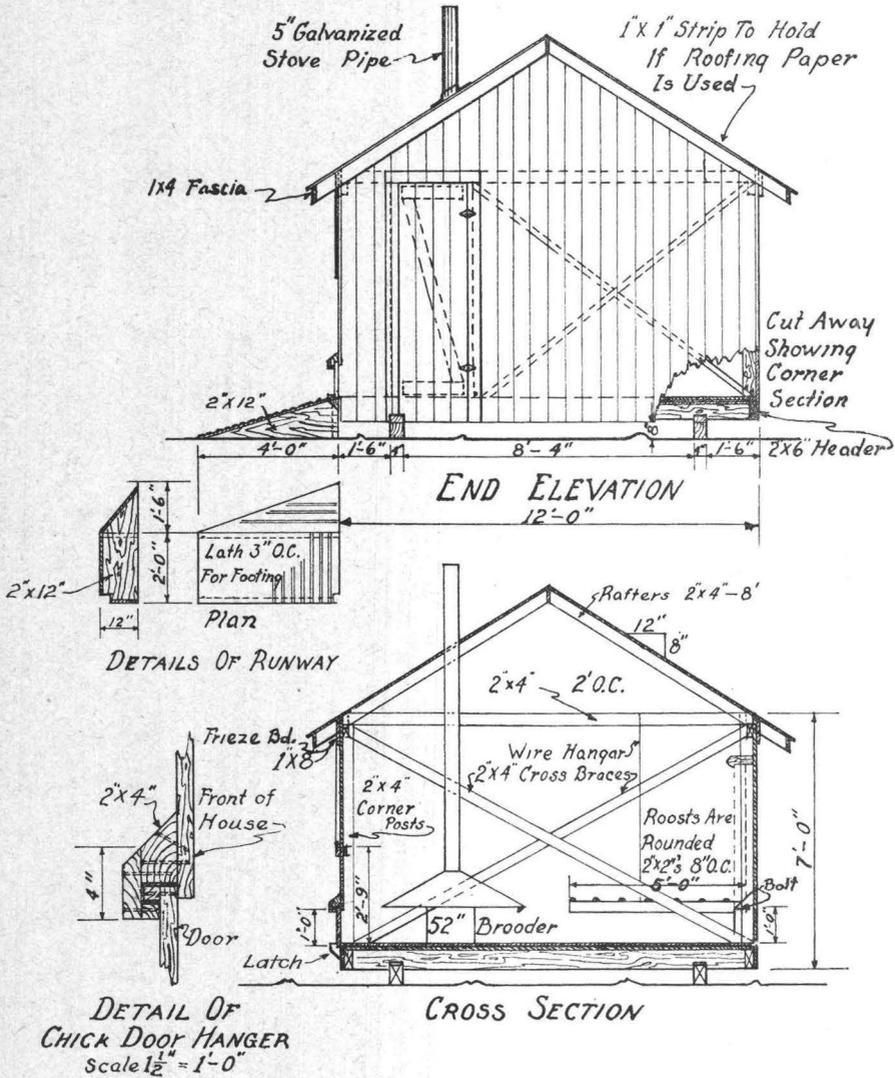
End Elevation and Cross Section of O.S.C. Portable Brooder House.
